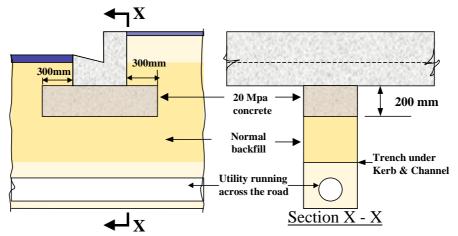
Concrete and backfill foundation under a concrete water channel or kerb
